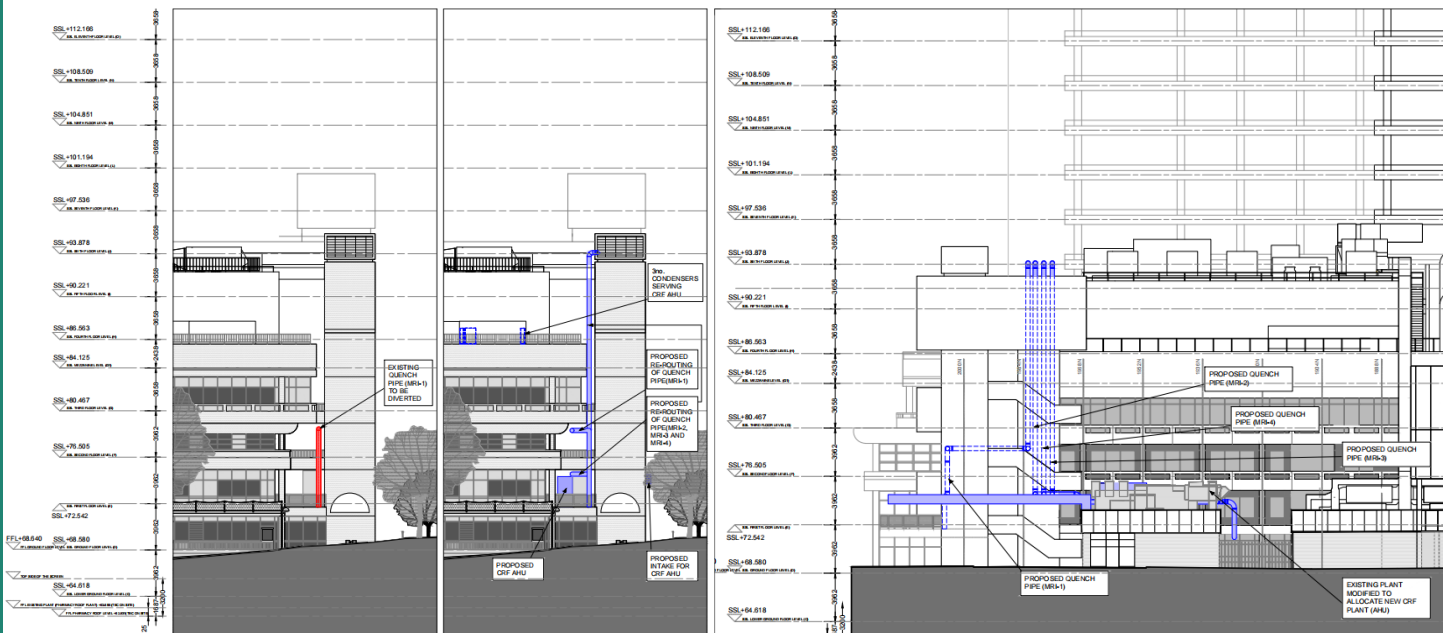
Permanent works (in blue) visible from Pond Street and HAS entrance
